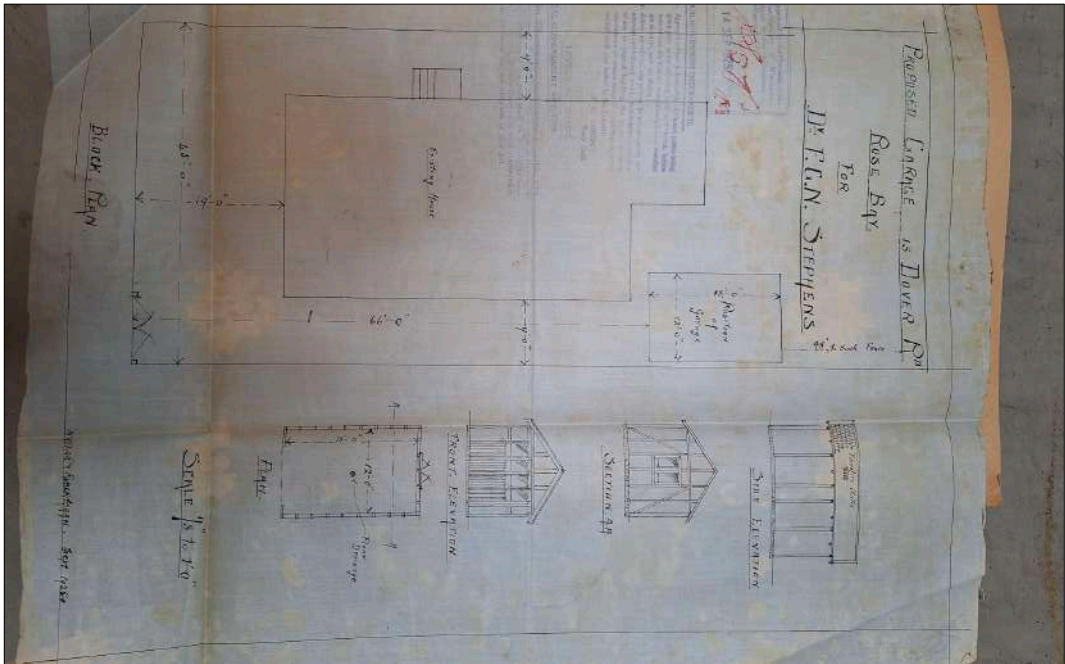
The building footprint of No. 25 Dover Road, Rose Bay, with plans for the proposed garage. DA1925/354.
